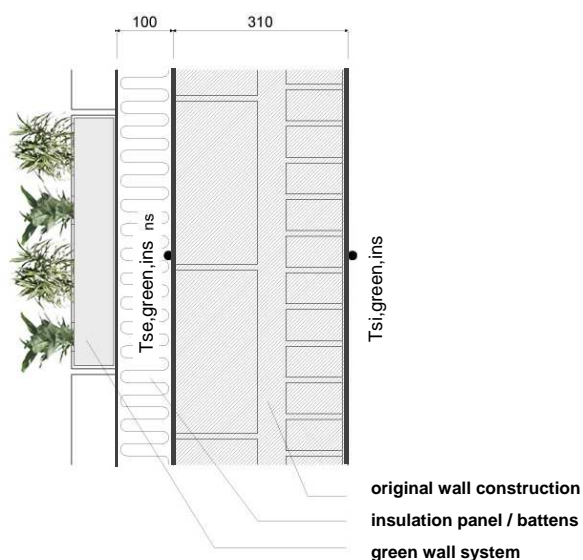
Section of green wall system with an added insulation layer. Thermocouples were located behind the insulation to measure the surface temperature of the original wall
